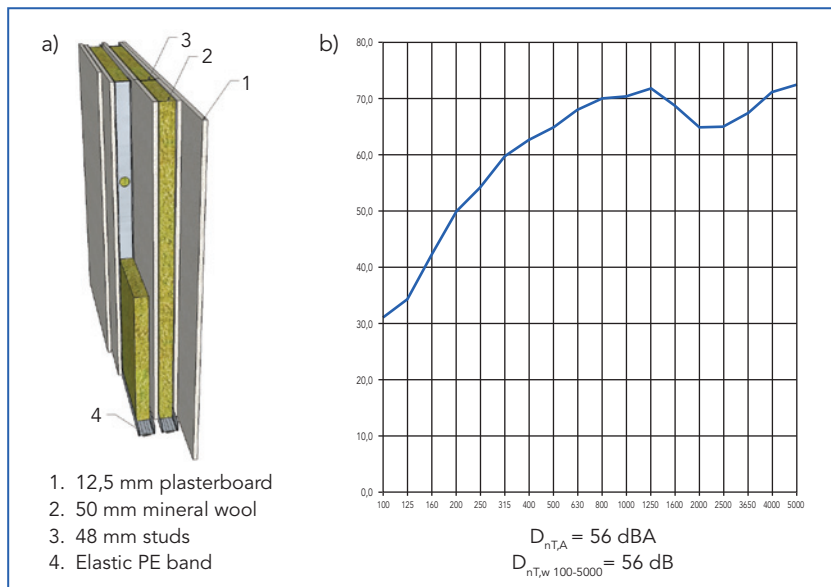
a) Example of Type 3 separating wall. Framed walls with absorbent materials. b) Typical airborne sound insulation.
